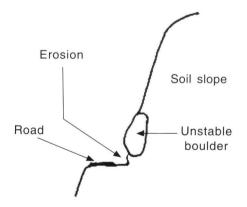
Cross Section of the Soil Slope with Unstable Boulder
